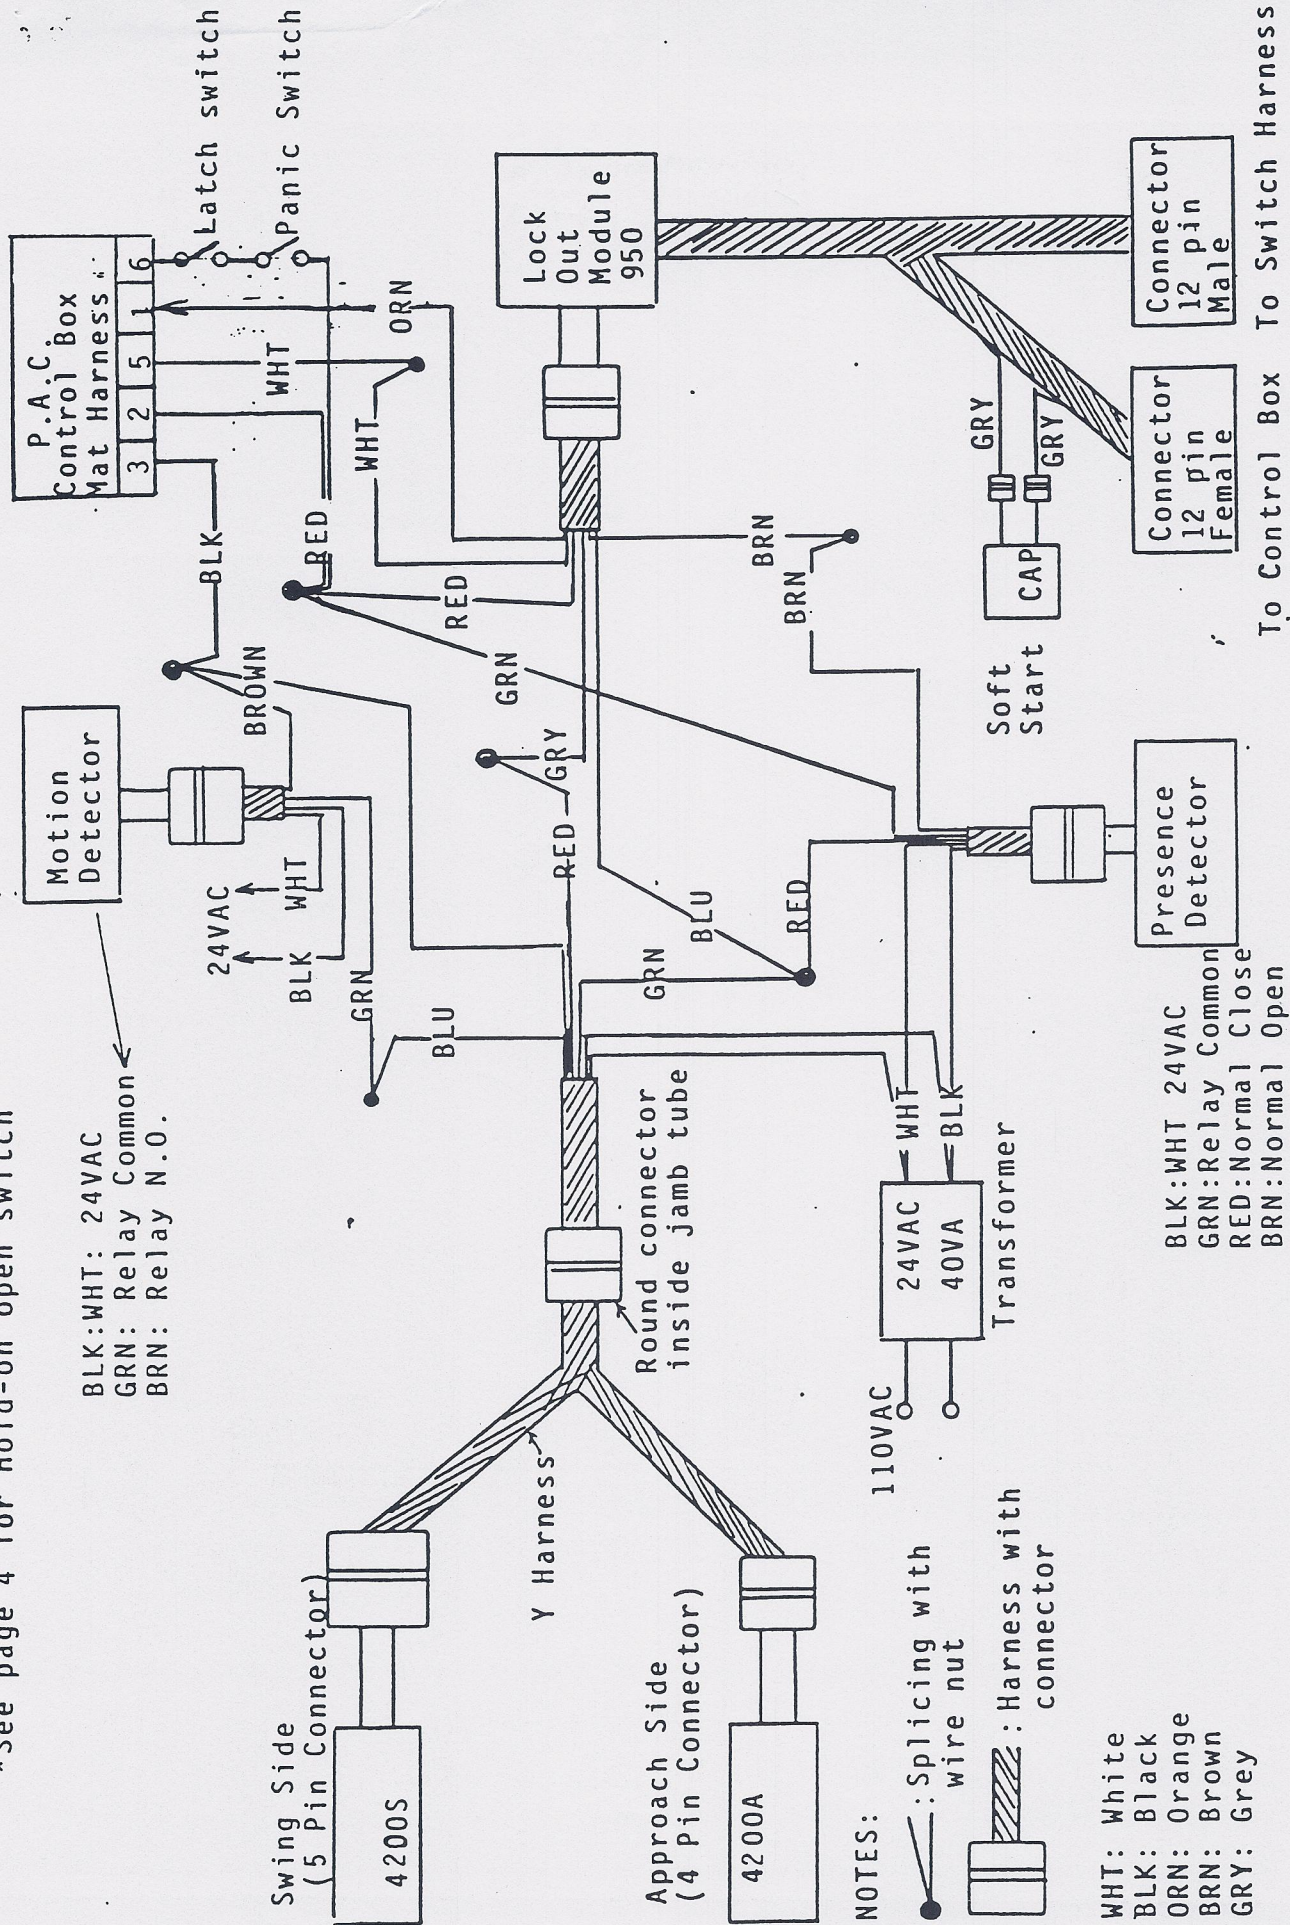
WIRING DIAGRAM FOR SINGLE DOOR - PAC
